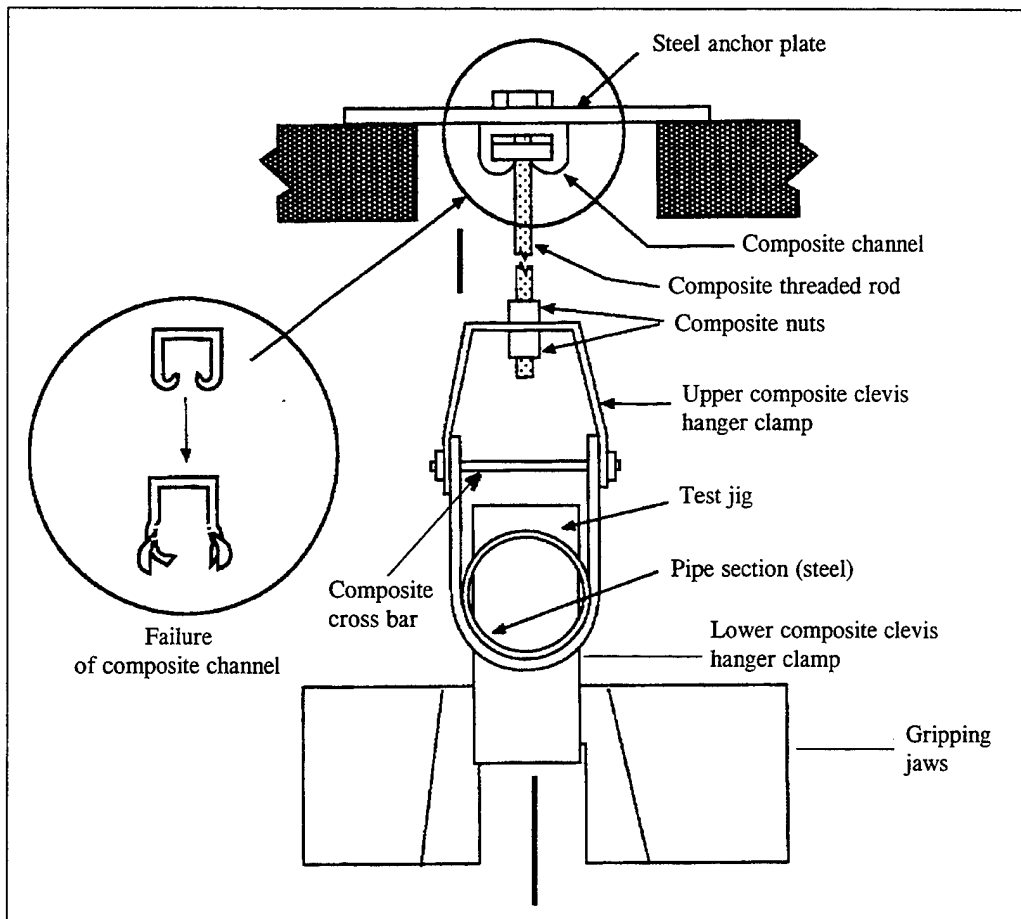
Test assembly for polyester and vinyl ester clevis hangers (using a channel).
